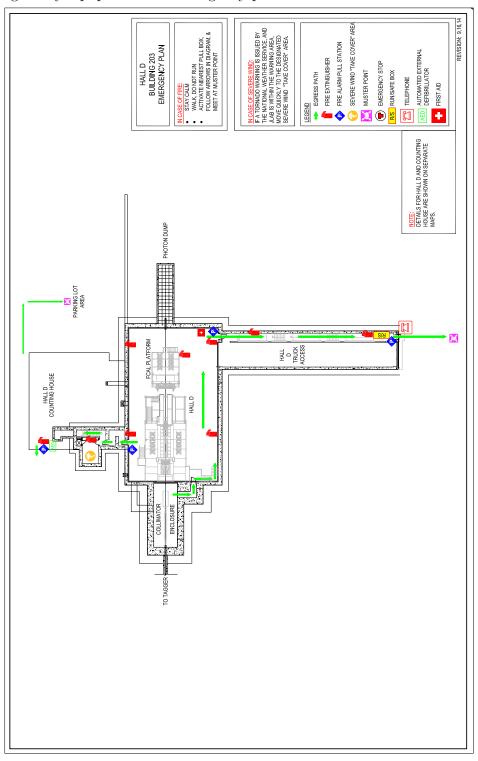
Layout of the Hall D counting house indicating safety equipment and emergency plan.
